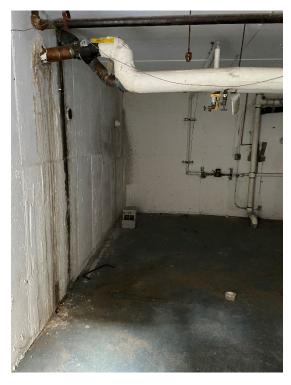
Looking west, view of SSDS legs belonging to the Building B blower (southern basement area); SVMP-B3 is located on the south wall.
